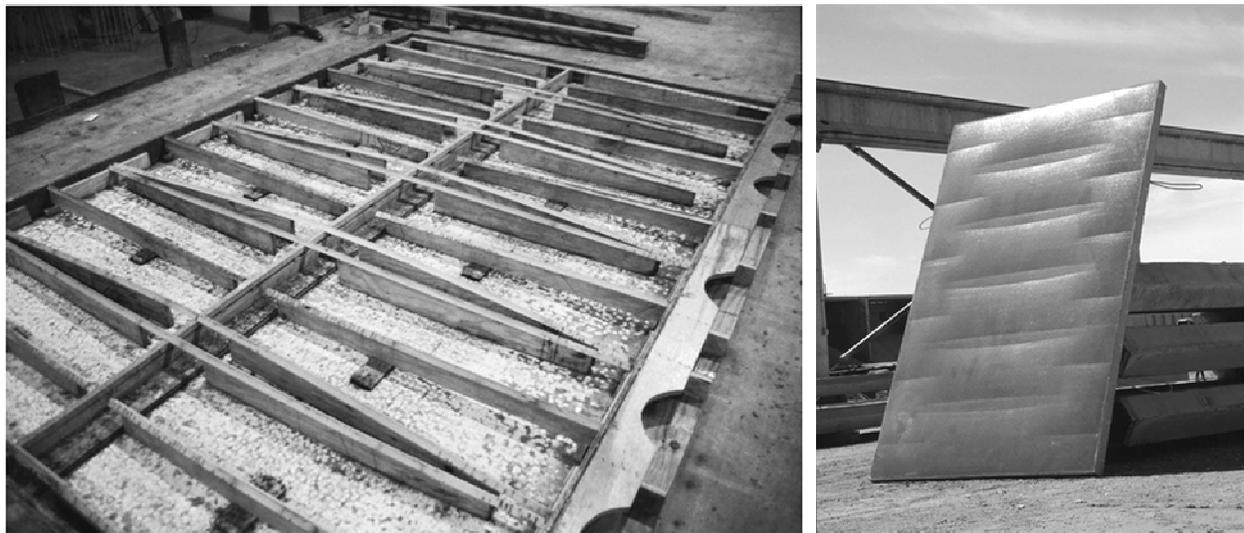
Full-scale formwork and completed concrete wall panel (C.A.S.T. photos).
